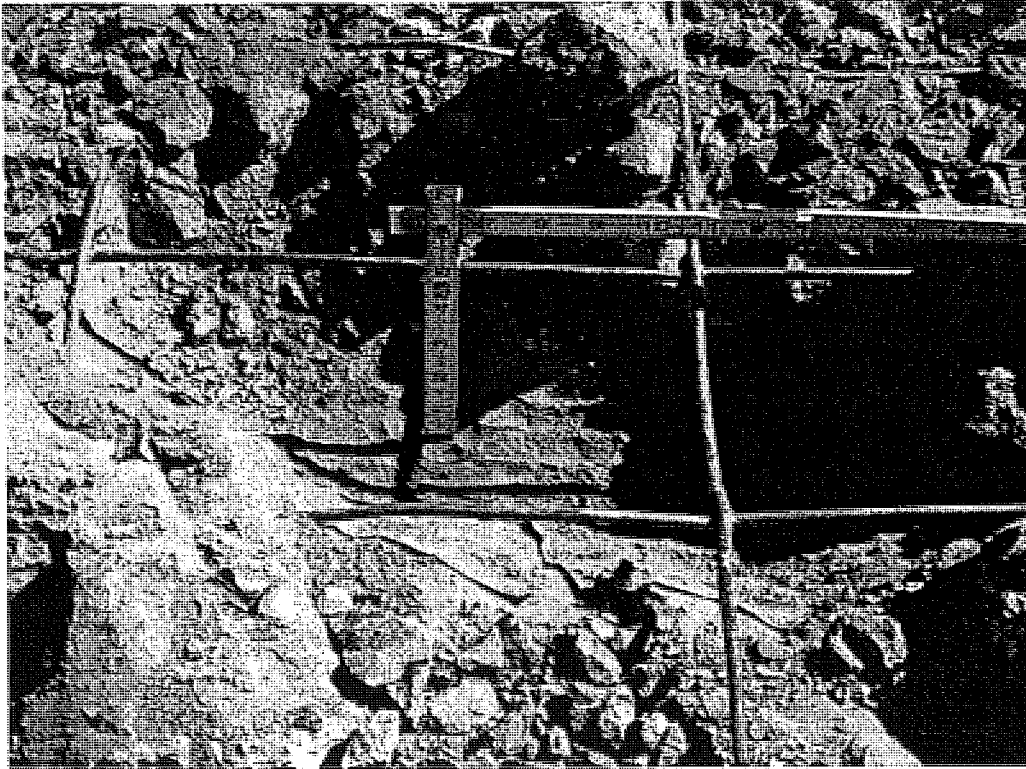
Excavated trench in a rubblized concrete slab showing the sand subbase and the fractured concrete
